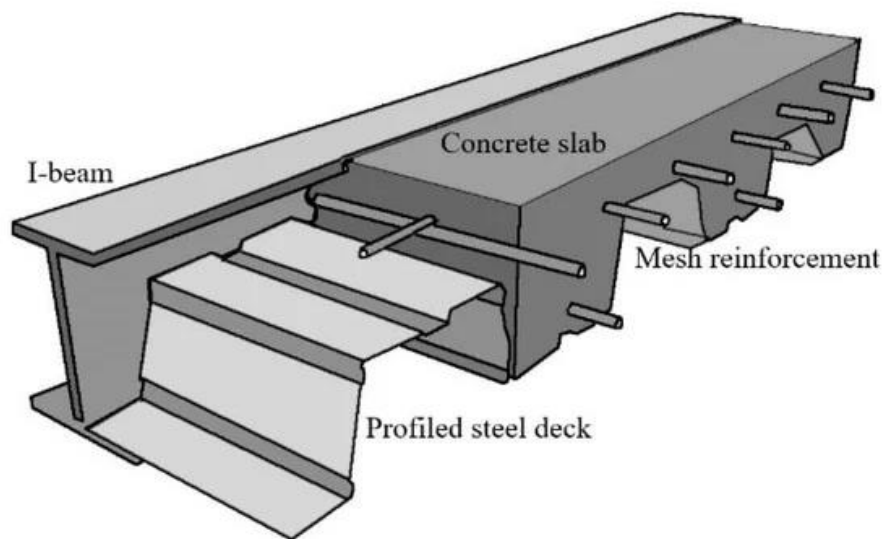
Composite Floor System with I-Beam, Concrete Slab, Steel Deck, and Reinforcement
